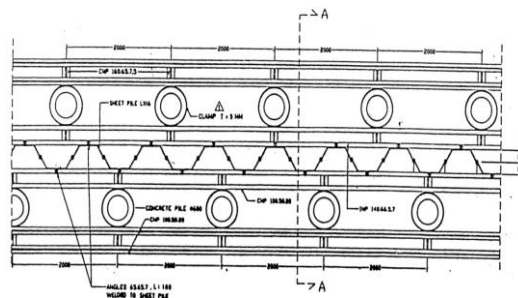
JETTY CONSTRUCTION OF GRATI PLTGU (LONG SECTION)
